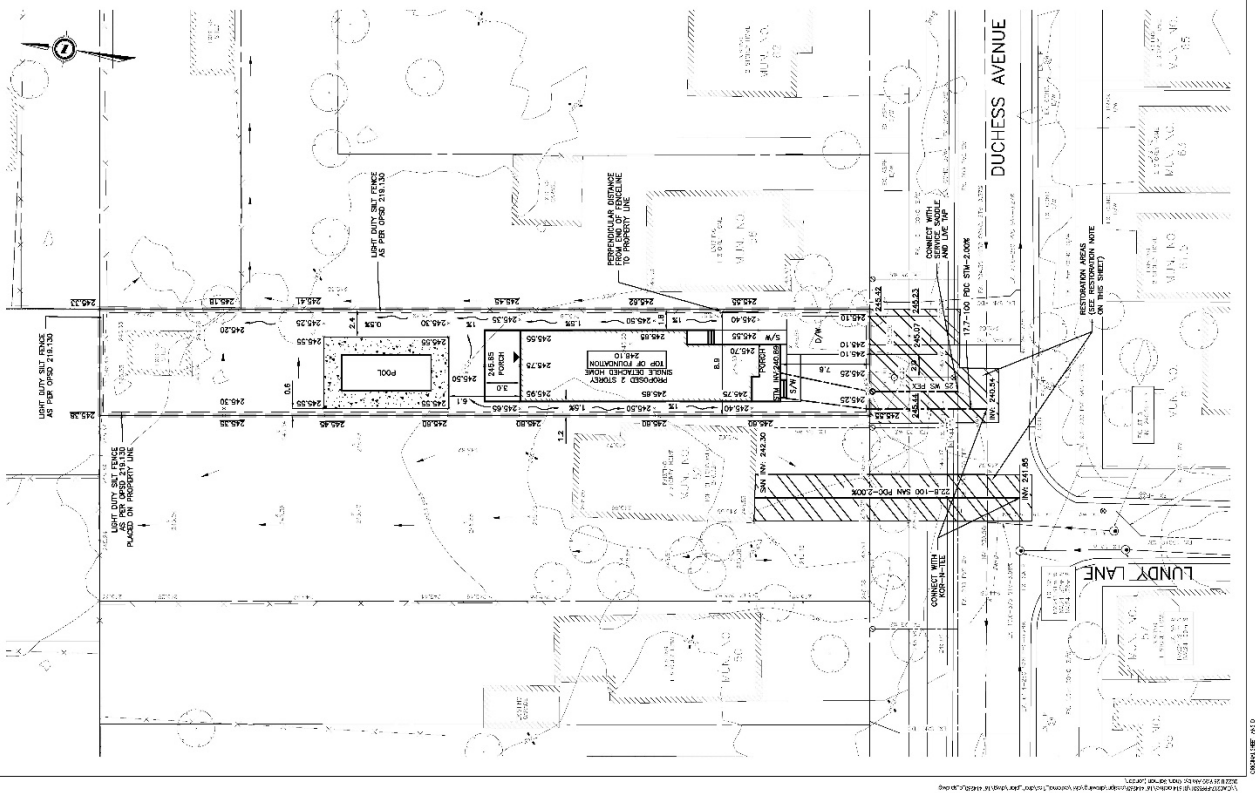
Site Plan submitted with the Heritage Alteration Permit application for 54 Duchess Avenue. The front yard parking shown in the Site Plan was approved as part of the Minor Variance application (A.109/22).
